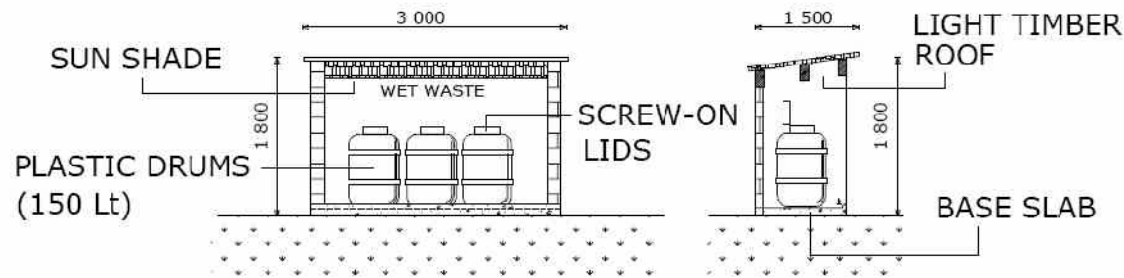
Wet wastes handling centre (left), and a typical sun shade (right)
